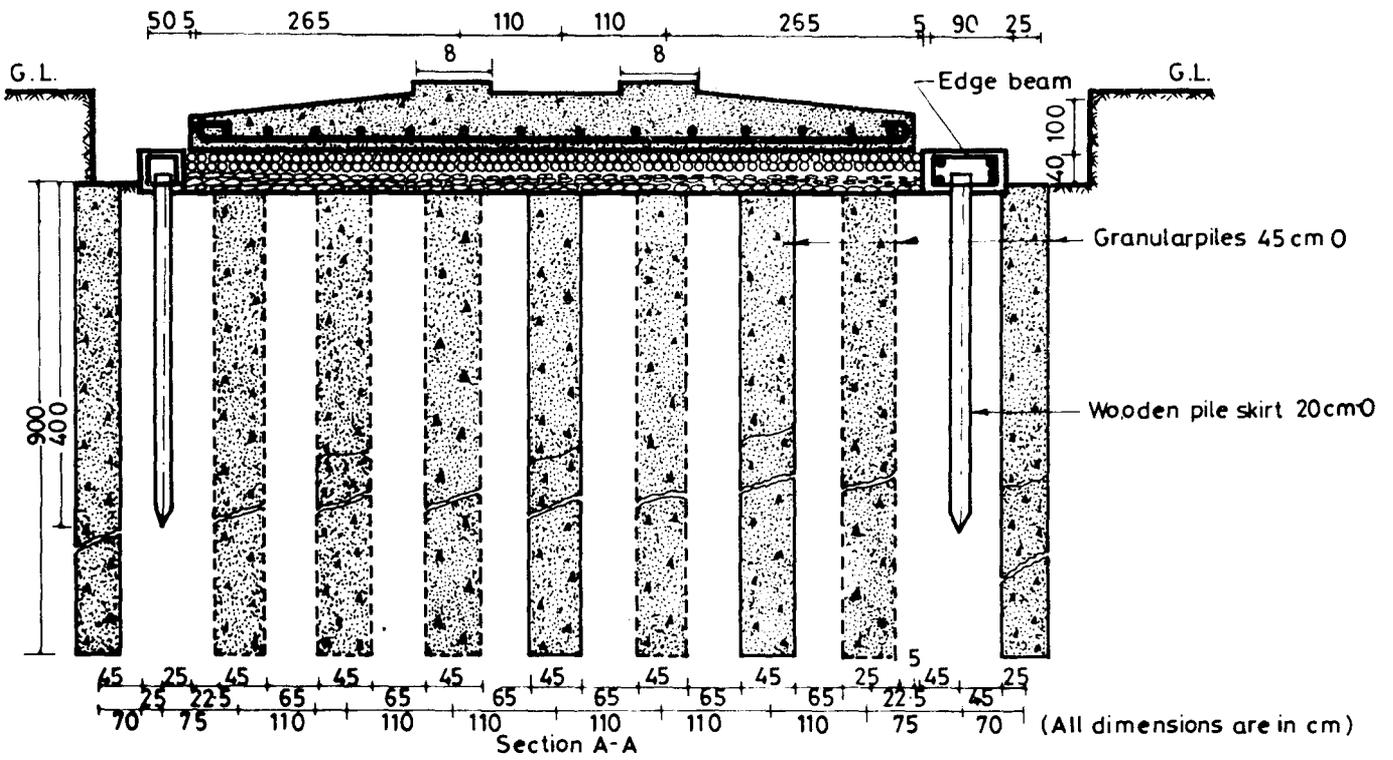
SKIRTED GRANULAR PILE FOUNDATION
